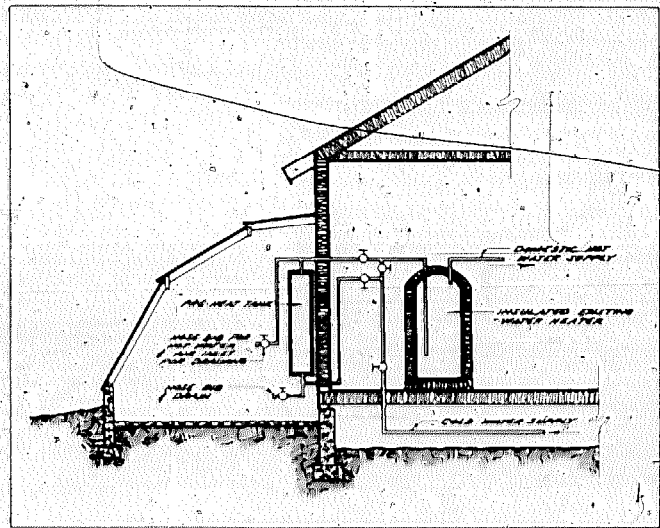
Greenhouse preheat tank for domestic hot water use
